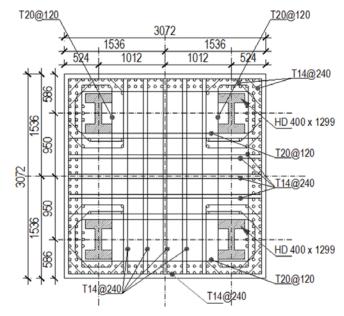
Final cross section using multiple Jumbos untied between the floors (Source: Plumiecs & ULg)
